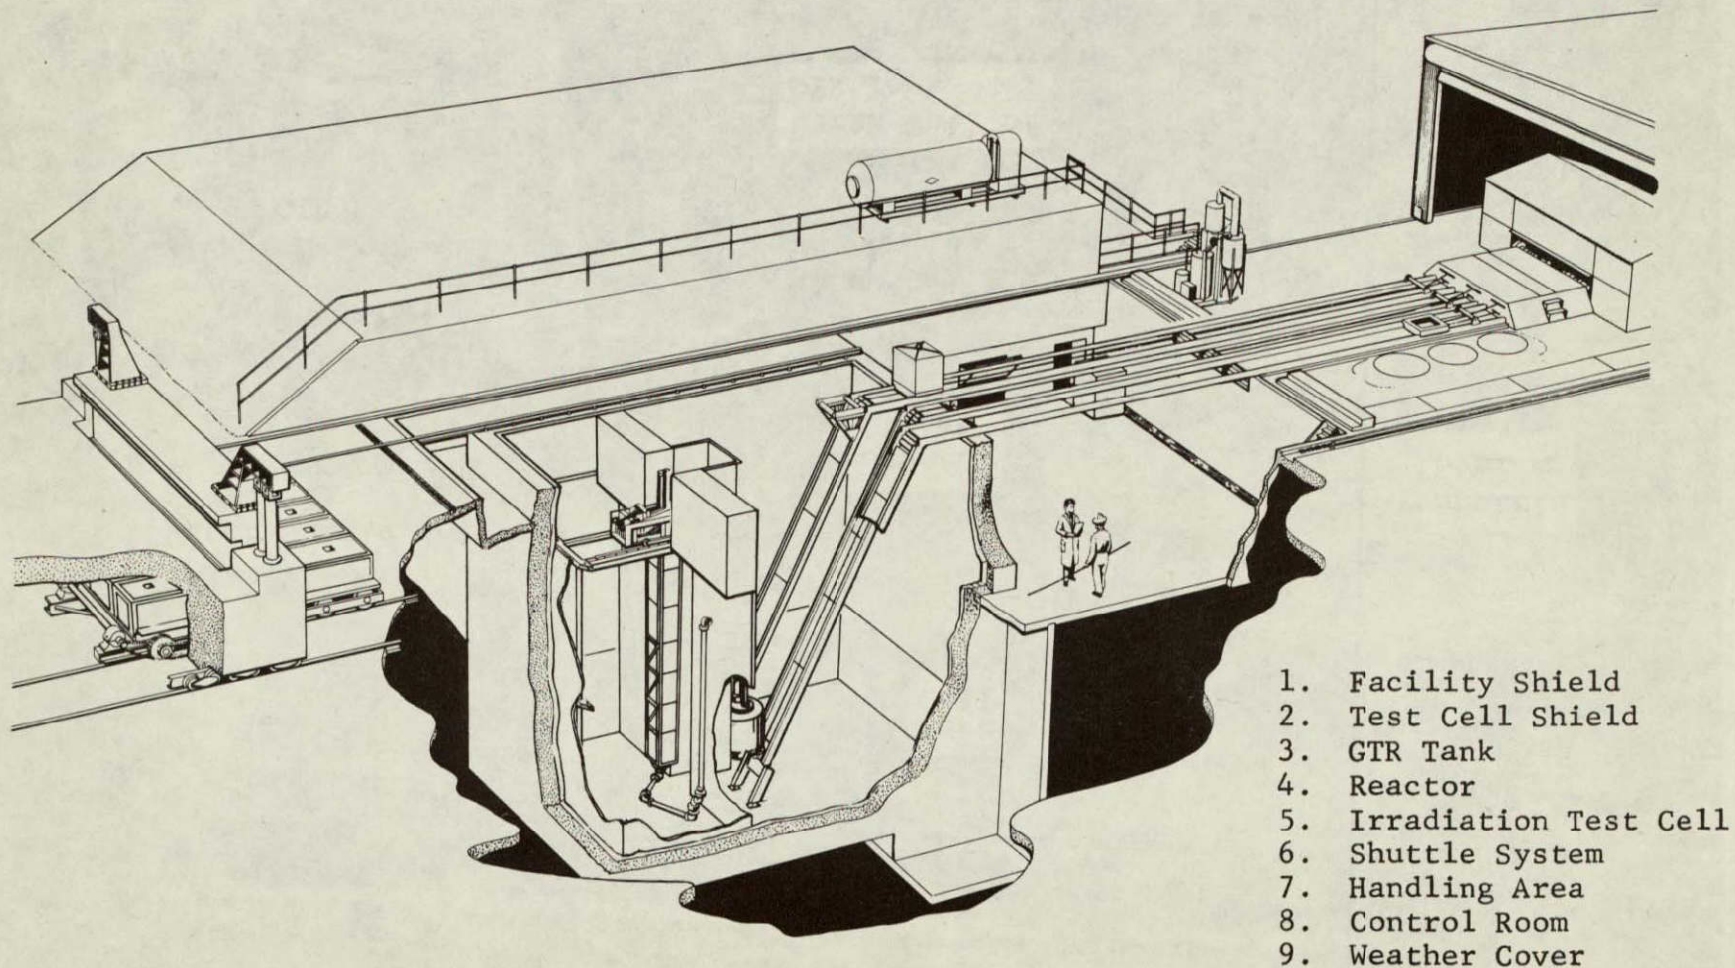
GTR Tank and Irradiation Test Cell - Cutaway View
